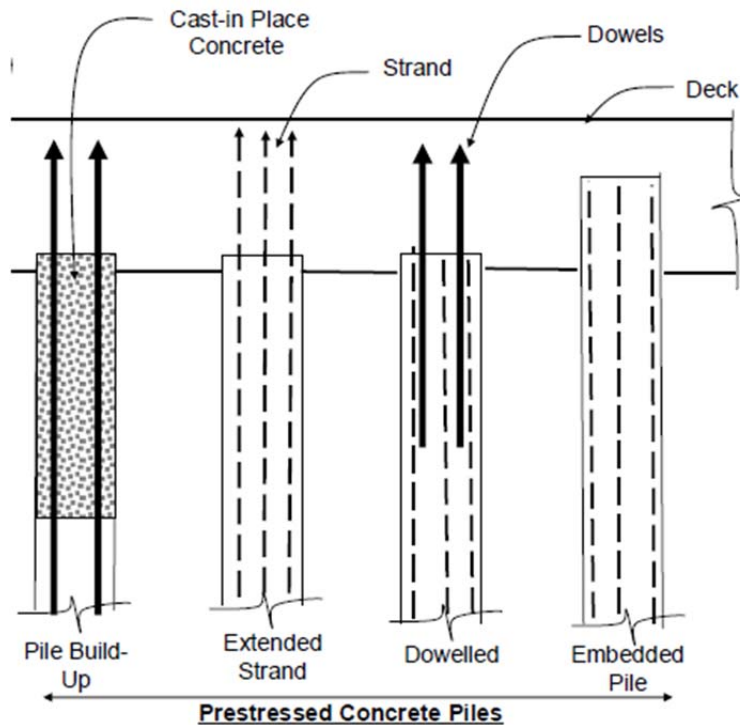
Typical Connections between Prestressed Piles and CIP Bent Caps
